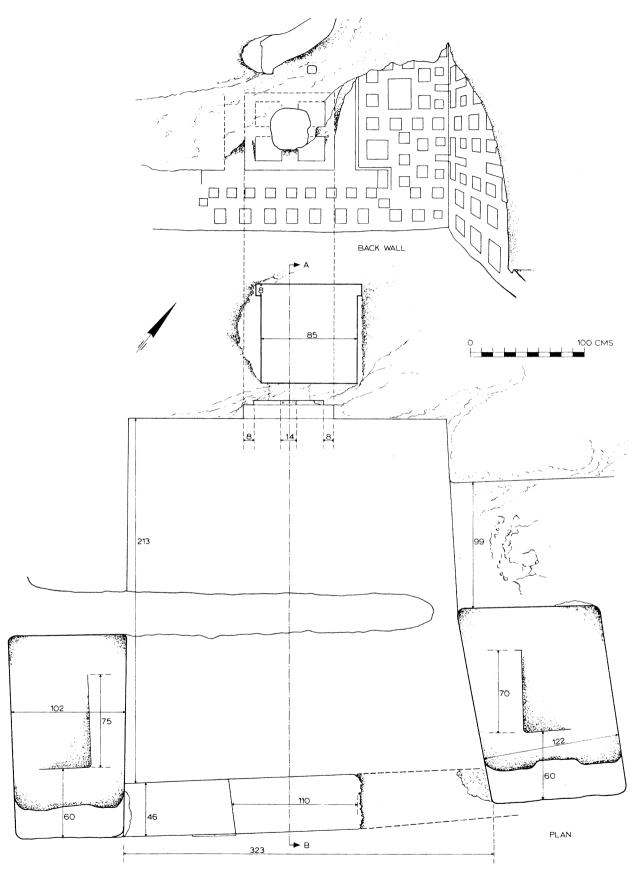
Değirmen Yeri: plan and back wall (after Haspels 1971, fig 521)
